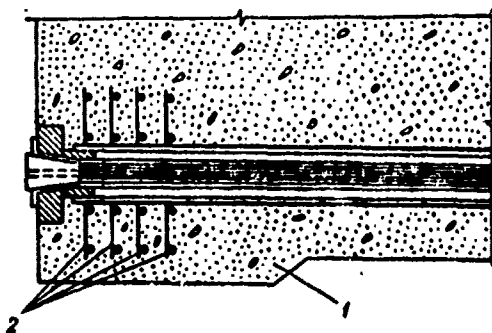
Local reinforcement of the supporting portion of prestressed reinforced-concrete elements with bundle reinforcement. 1 - increasing the thickness of the protective layer of concrete at a support under an anchor; 2 - installing additional welded grids near the anchor.
